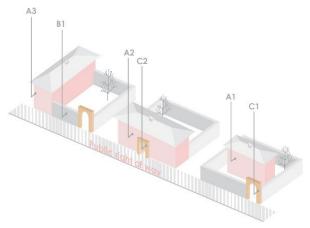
The regulated components of the facade (A1: main facade facing the courtyard or the private facade, A2: back facade connected to the passageway, A3: side facade connected to the passageway, B1: boundary wall, C1: main entrance gate as separated from the building, C2: main entrance gate connected to the building). Source: Authors.
